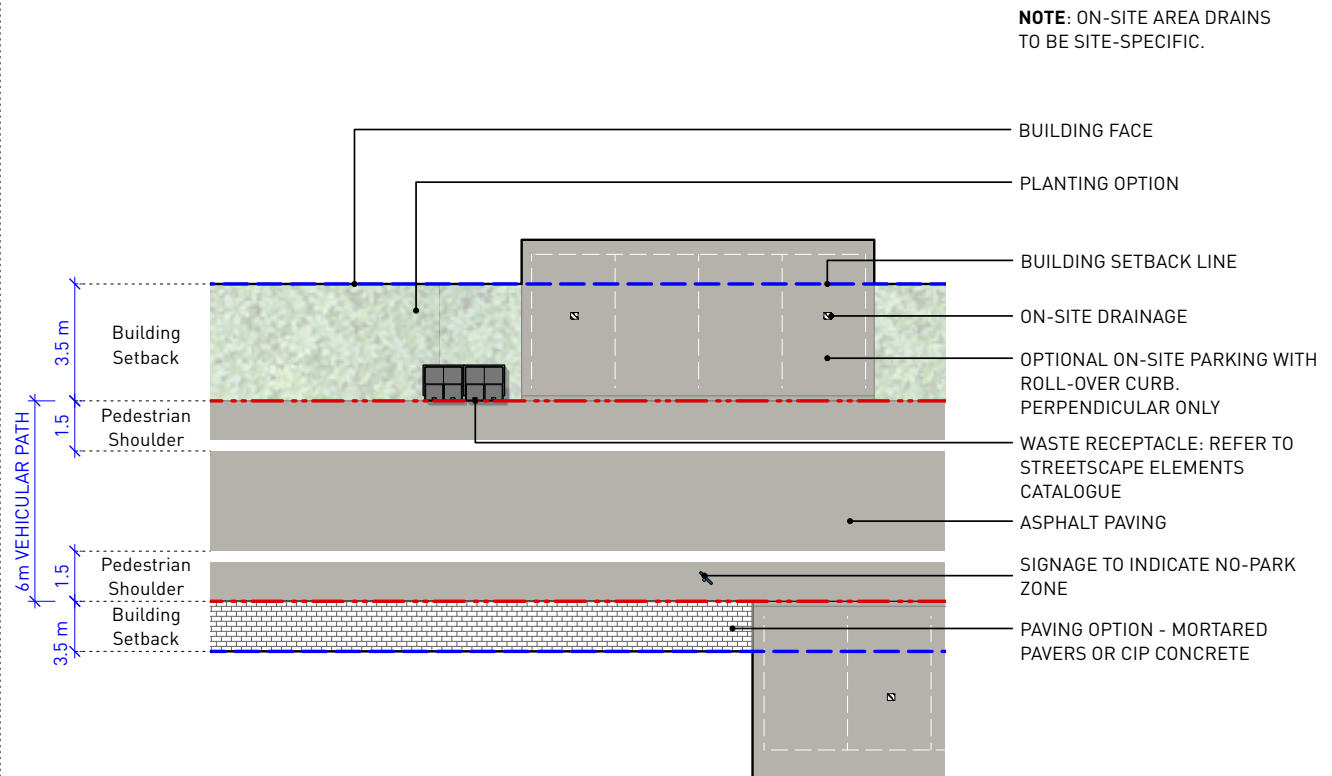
ENLARGEMENT 2 - TYPICAL LANEWAY
